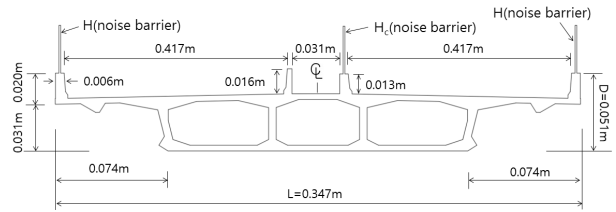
Model of a Box-Type Girder Bridge for CFD
